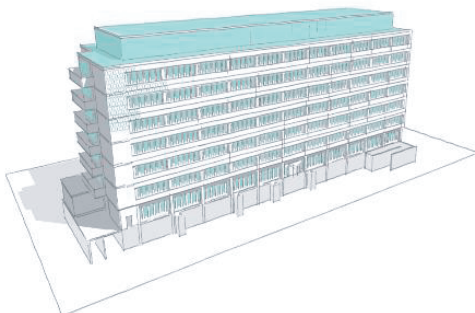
Demolish and build new. It is assumed that the existing building is demolished and a new standard office building is constructed. Mentioned as scenario 1 later on.
